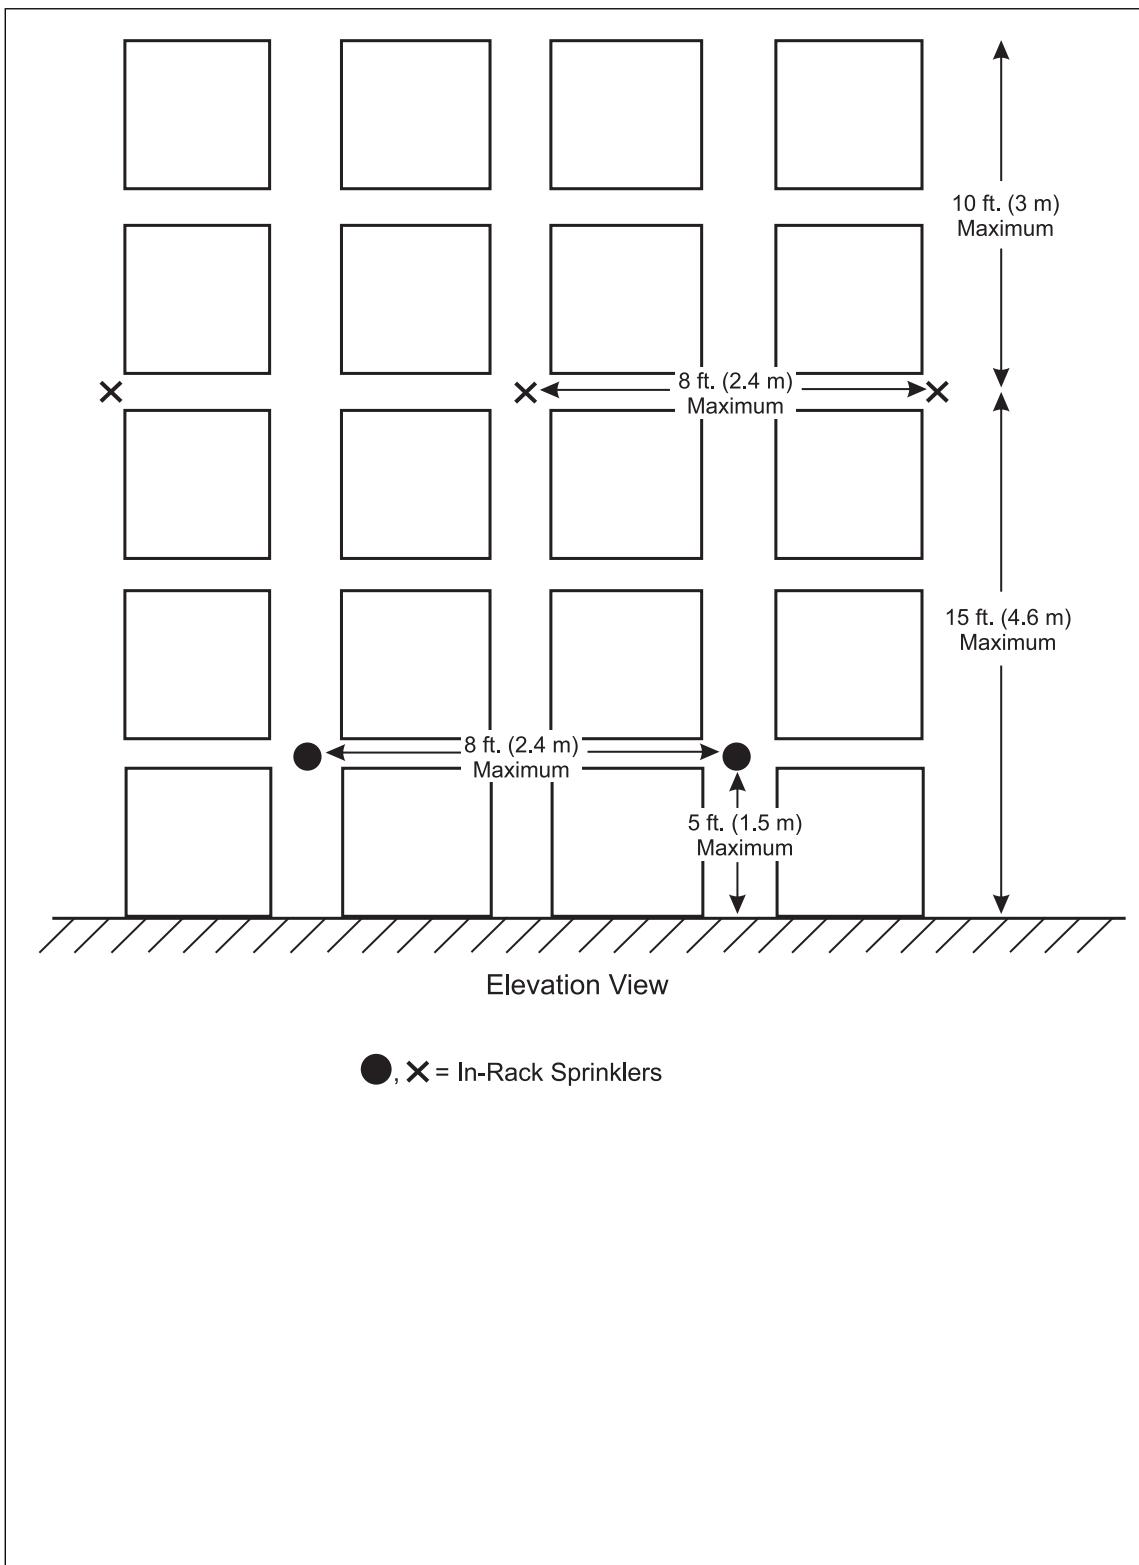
Multiple-row rack sprinkler layout: quick response sprinklers protection scheme (elevation view)
